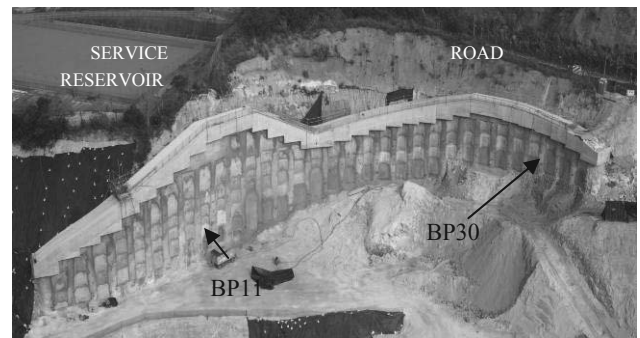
Excavation of the cantilever bored pile wall (January 2012)
